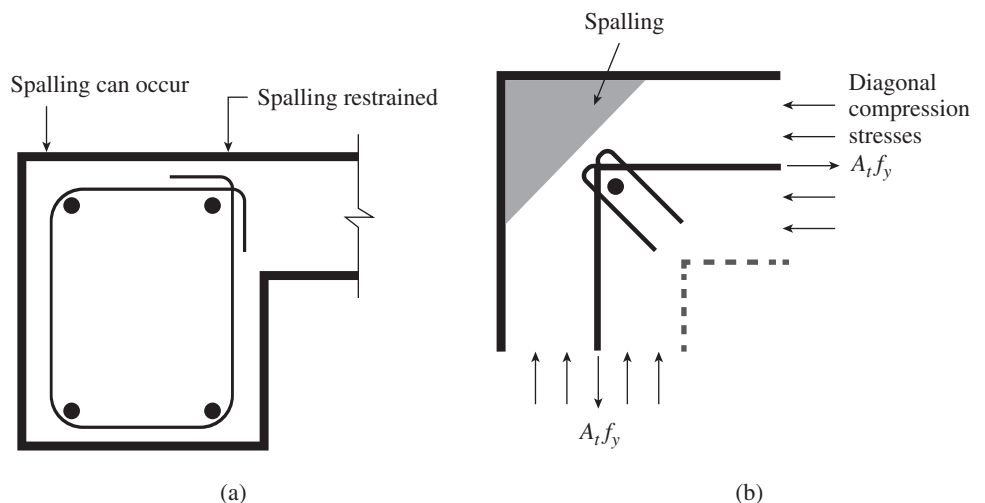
Possible spalling of concrete at the corners due to torsion (a) Spandrel beam with 90° hooks—spalling prevented by an adjacent slab (b) Concrete spalling can be prevented by 135° hooks (Reprinted with permission from ACI)
